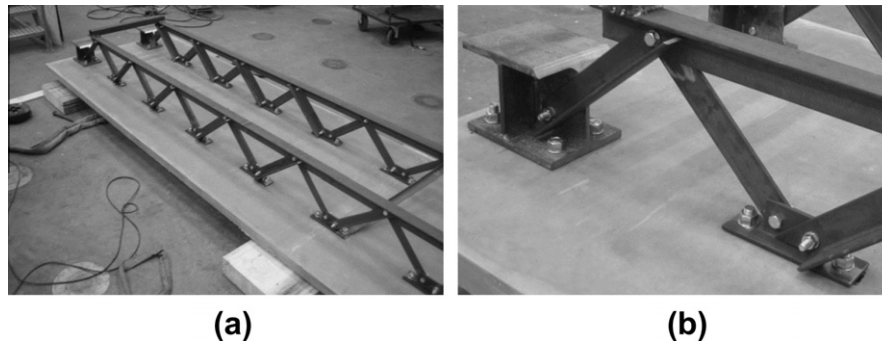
(a) Steel truss assembly. (b) Bolted connection to ECC slab.
